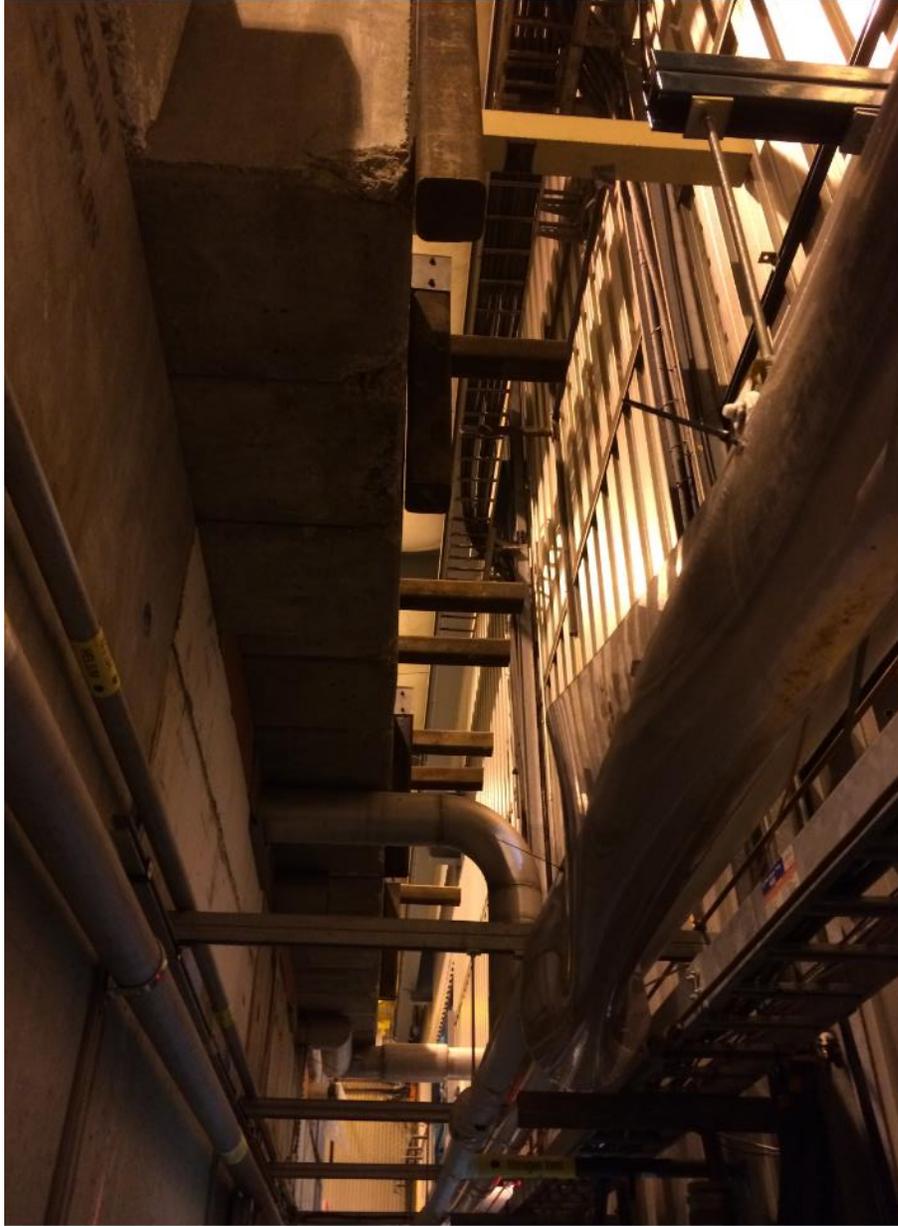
Photo III: The seams between roof beams on the east side were covered by steel hanging vertically down or by extending the steel bars over the sides to shadow the seams between roof beams. The extended steel bars can range for 30 to 46 inches long.
